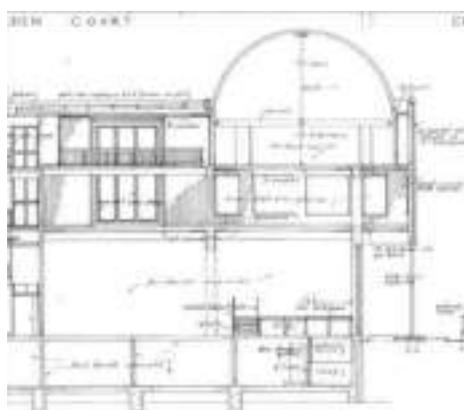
(left) Architect John Hendry's drawings for the proposed 1970 addition showing initial and proposed later stage of development.
